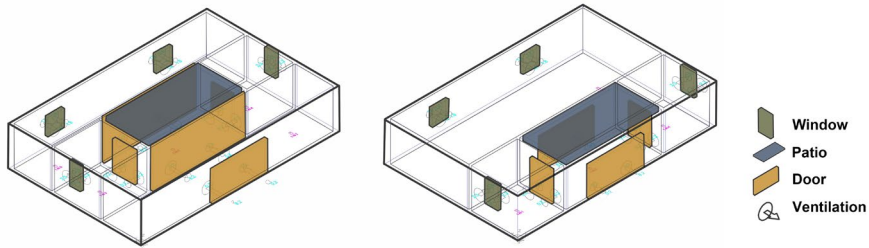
Left: Typical layout 1; Right: Typical layout 2
